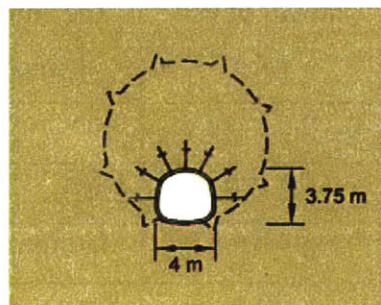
Exploratory adit located inside the final tunnel cross section
